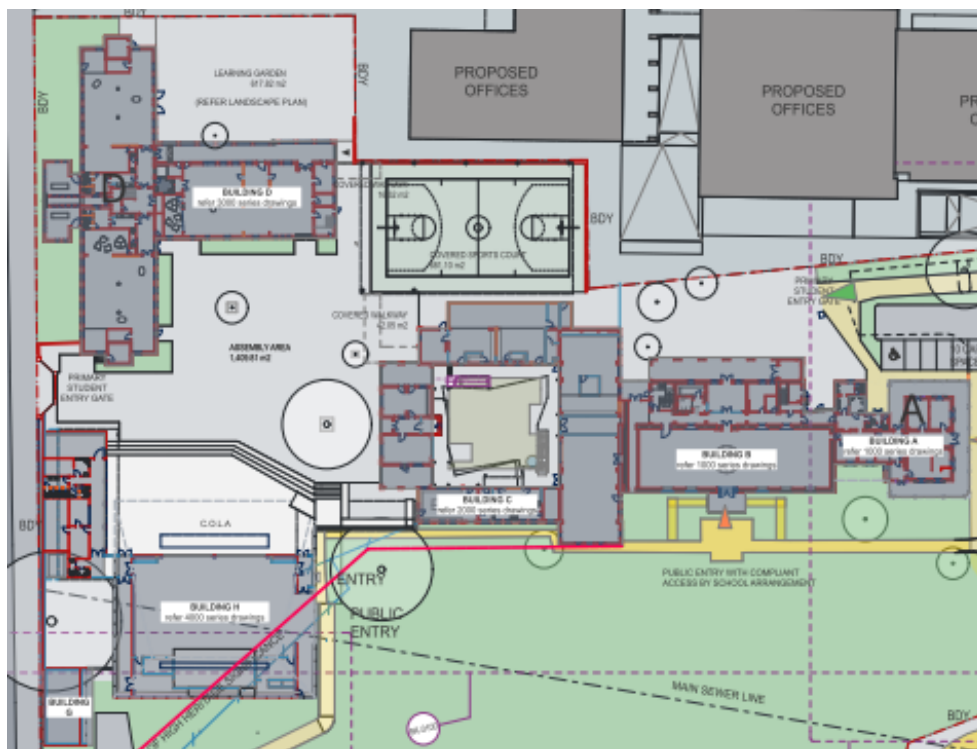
O'Connell Street Primary School – New and Refurbished Buildings
